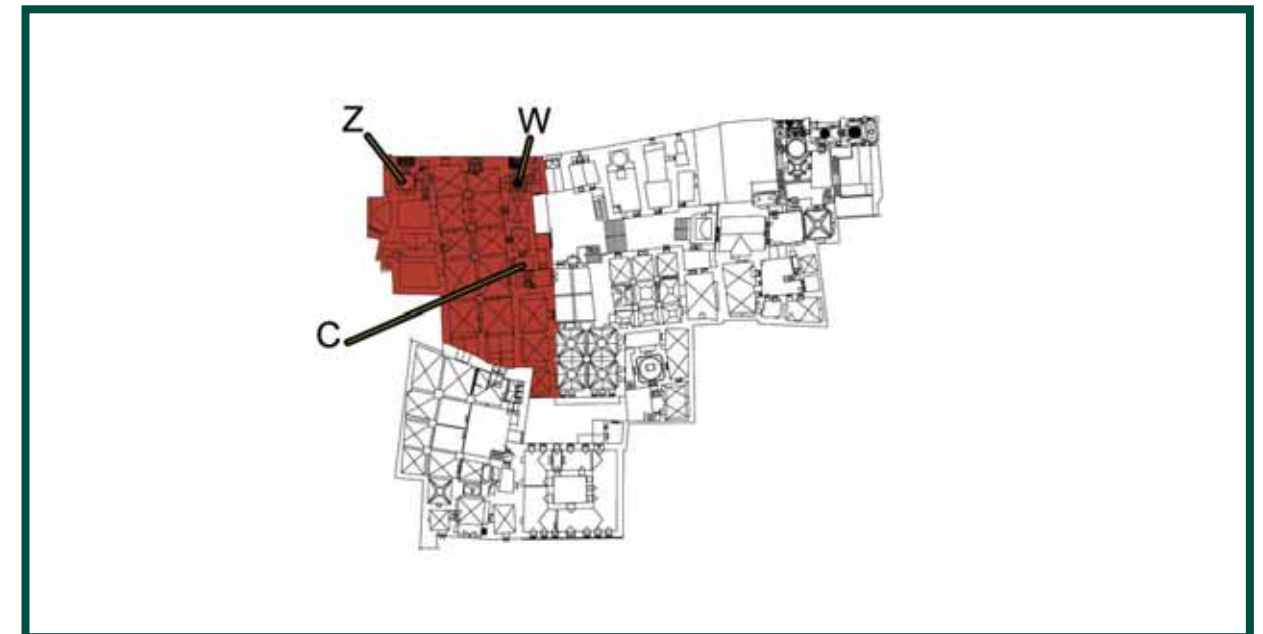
Plan of ground floor of Dar al-Sitt Tunshuq al-Muzaffariyya
